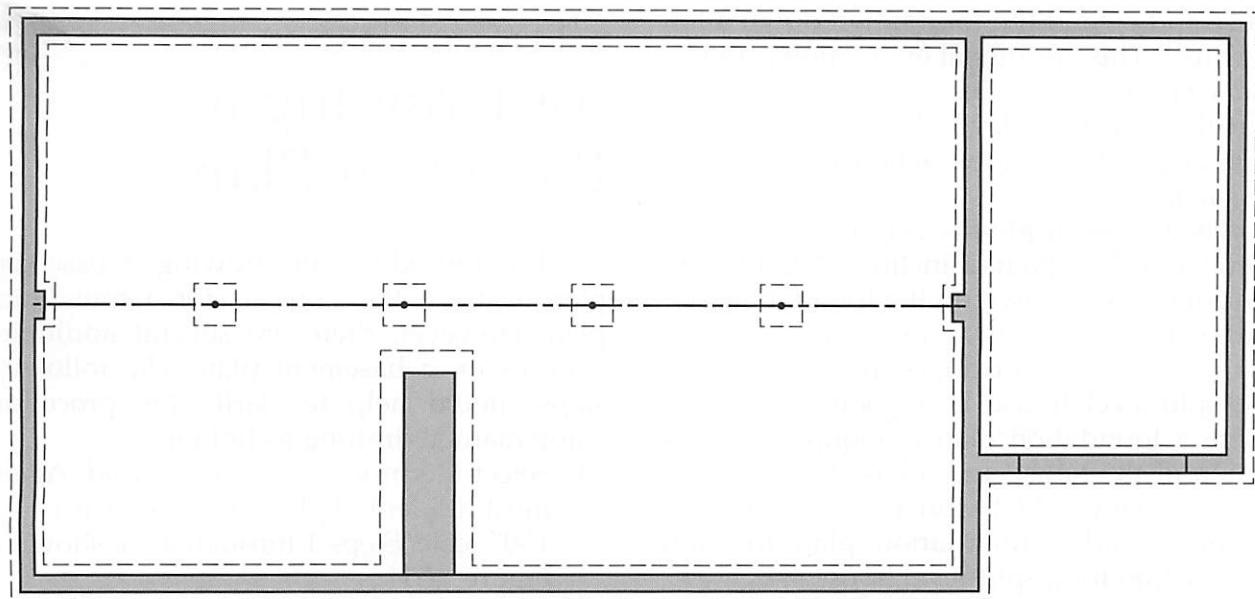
A partially completed basement plan showing the foundation walls, footings, beam, and posts/columns.
